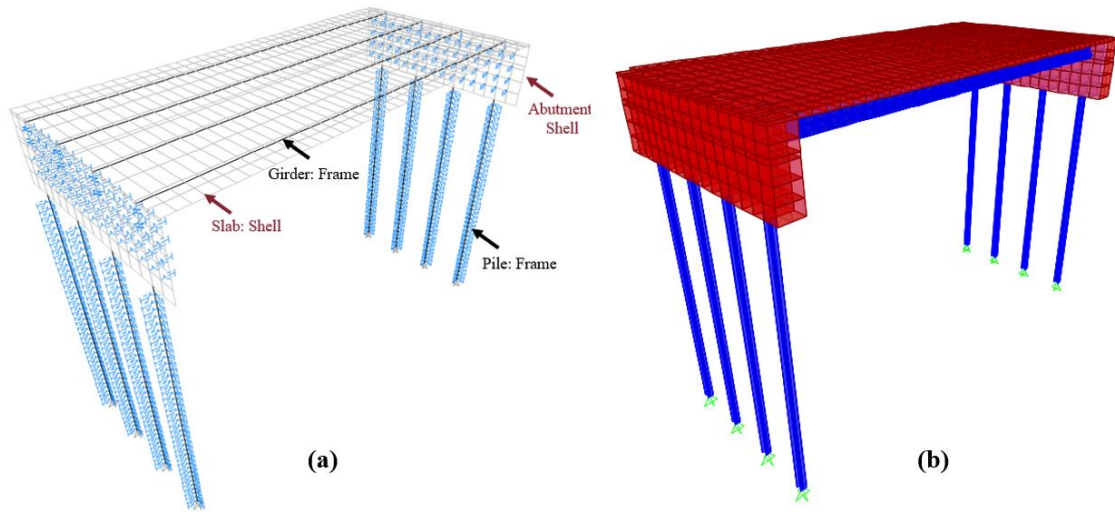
FEMs of Typical Prestressed Concrete Girder IABs in (a)Element View and (b)Extruded View
